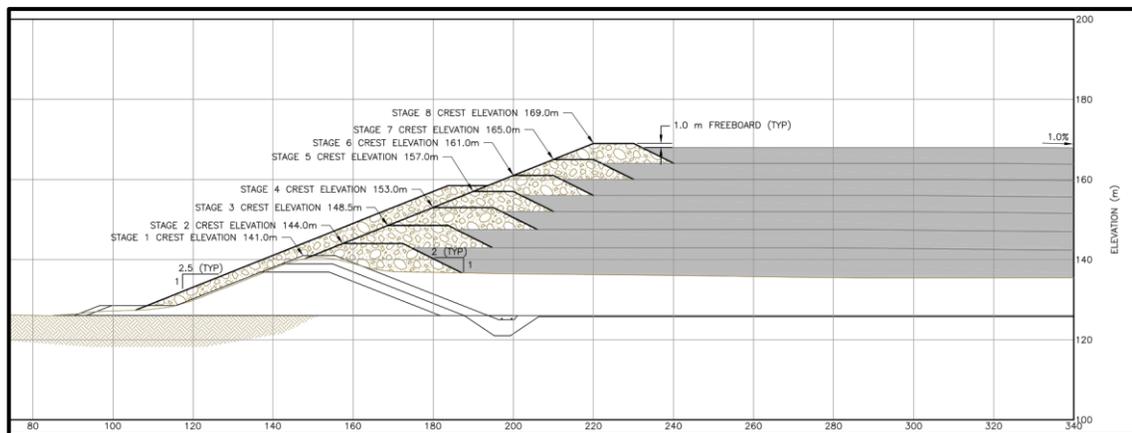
TSF1 Embankment Section, Tierra Group Aug 2025
